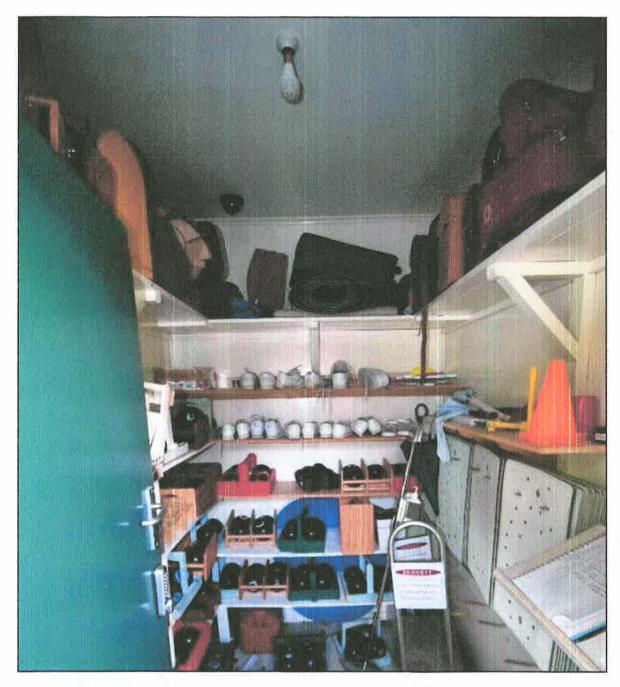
Outside the pavilion looking north-west into the Mat Room. This circa 1989 cupboard will be converted into the internal passageway joining the pavilion to the amenities block.
